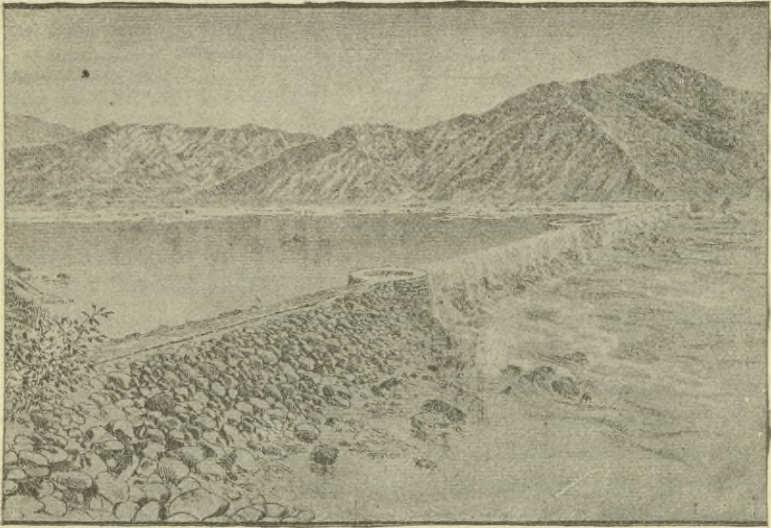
VIEW OF SAN FERNANDO SUBMERGED DAM.
